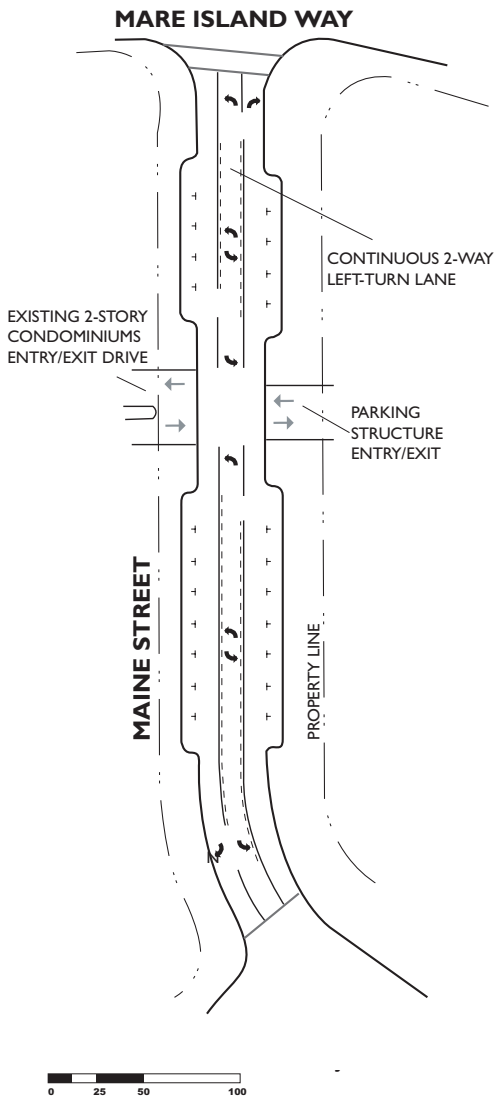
C.41: Concept Plan of Reconfigured Maine Street
